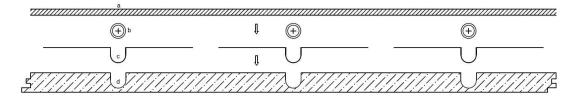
a) Floor covering, b) Pipe, c) Heat distribution plate, d) Under-floor plate, 22 mm.
